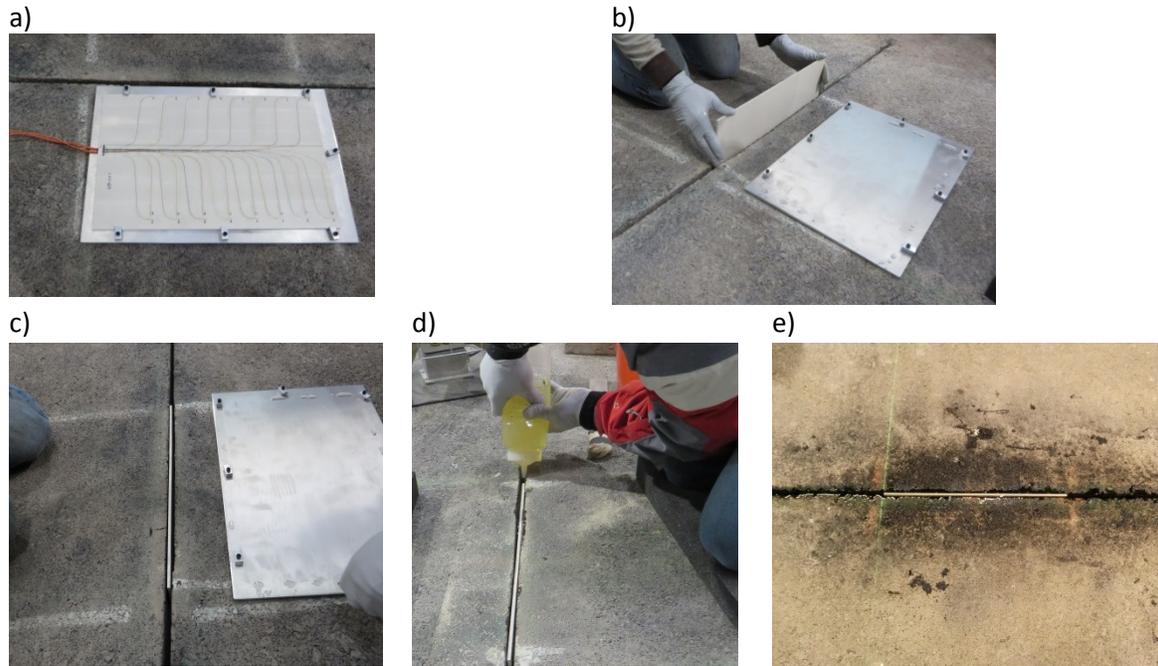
Instrumented plate installation: a) Sawcut and plate; b) Plate insertion in the sawcut; c) Plate inserted in the cut; d) Filling of the cut with epoxy; e) Installed plate.
